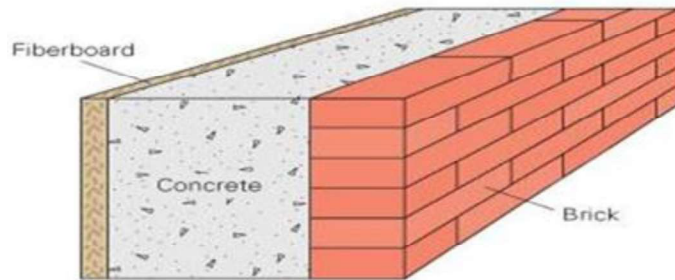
A faced wall of fiberboard and brick held together by concrete
